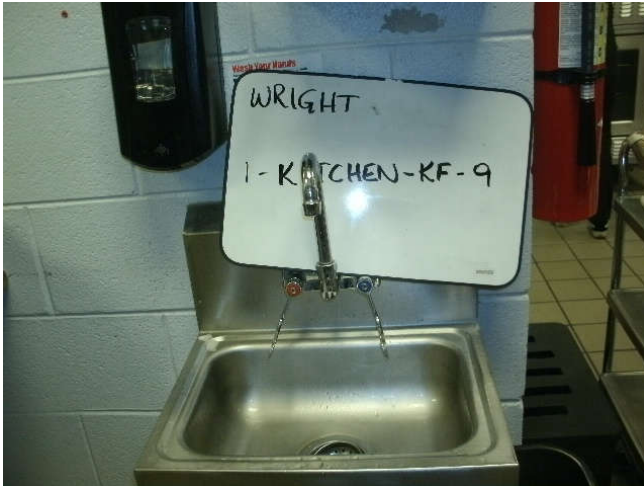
Kitchen faucet, located on the 1st floor in the kitchen (hand washing).
